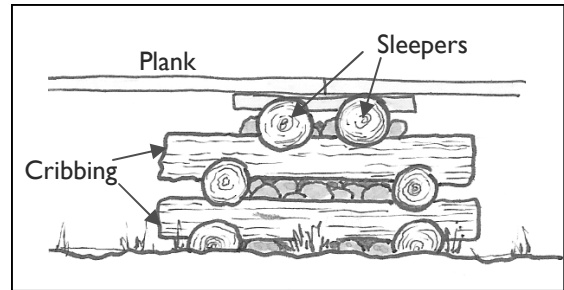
Bog Bridge with Sleepers, or Single Plank Boardwalk
